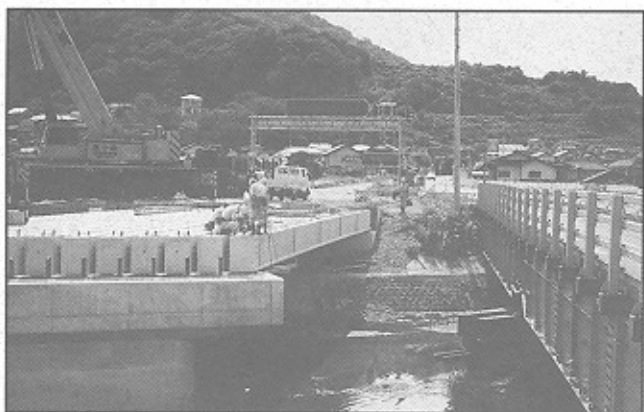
CFCC used for prestressing the Sanze Bridge in Japan
